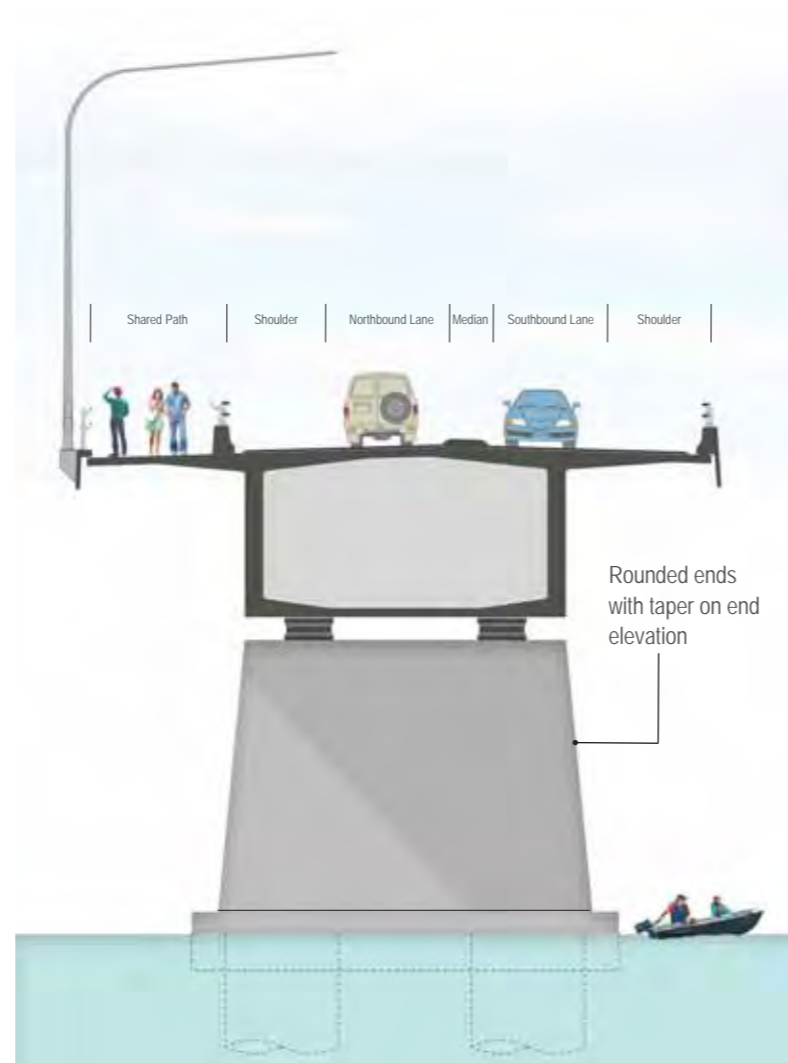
Additional bridge over Clarence River at Grafton - Shows standard pier type (Scale 1:200)
